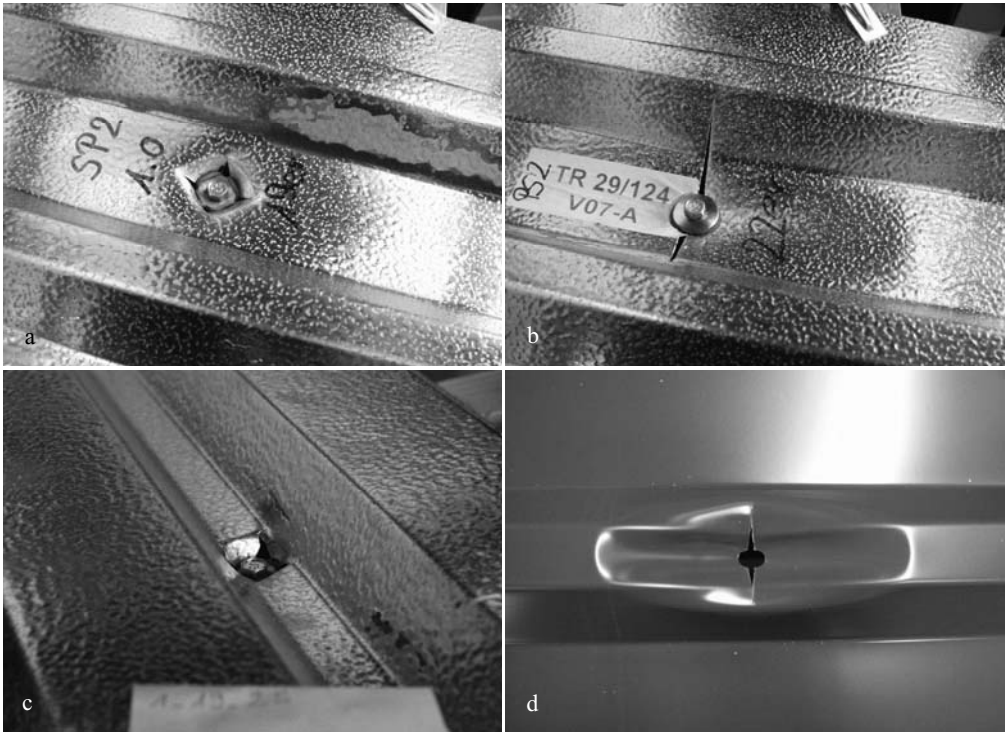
Failure modes of fixings of aluminium trapezoidal sheeting.
